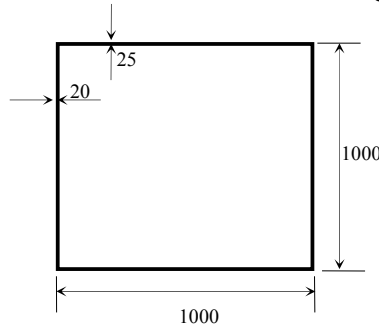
Dimensions (in mm) of Cross-Section of Box Girder
